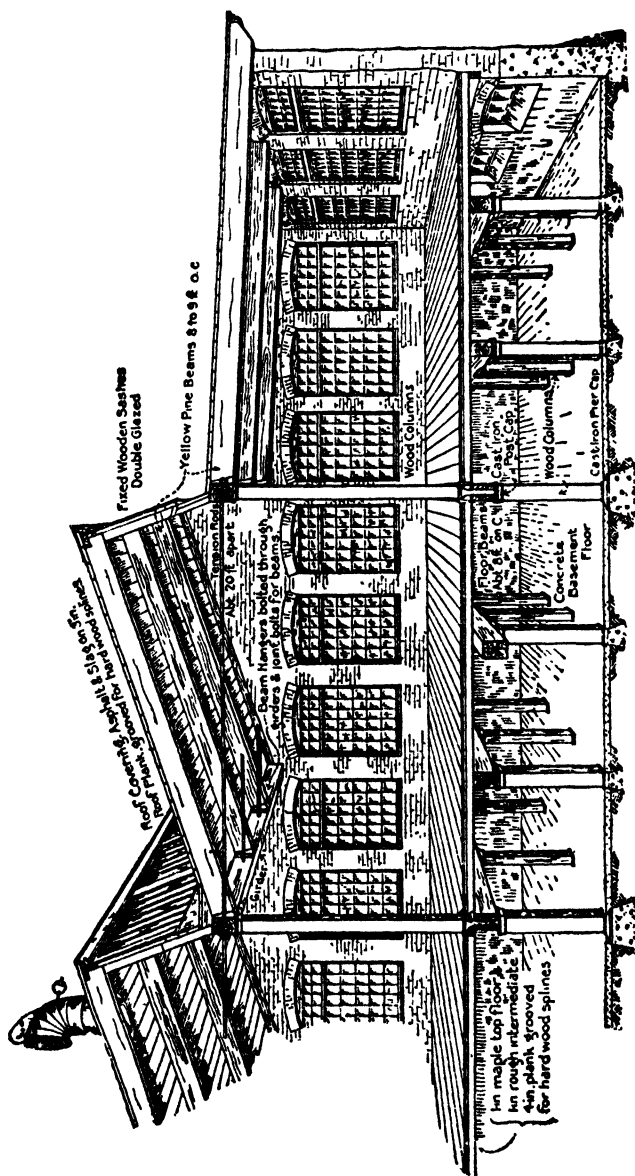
Saw-tooth Roof for Textile Weave-shed
